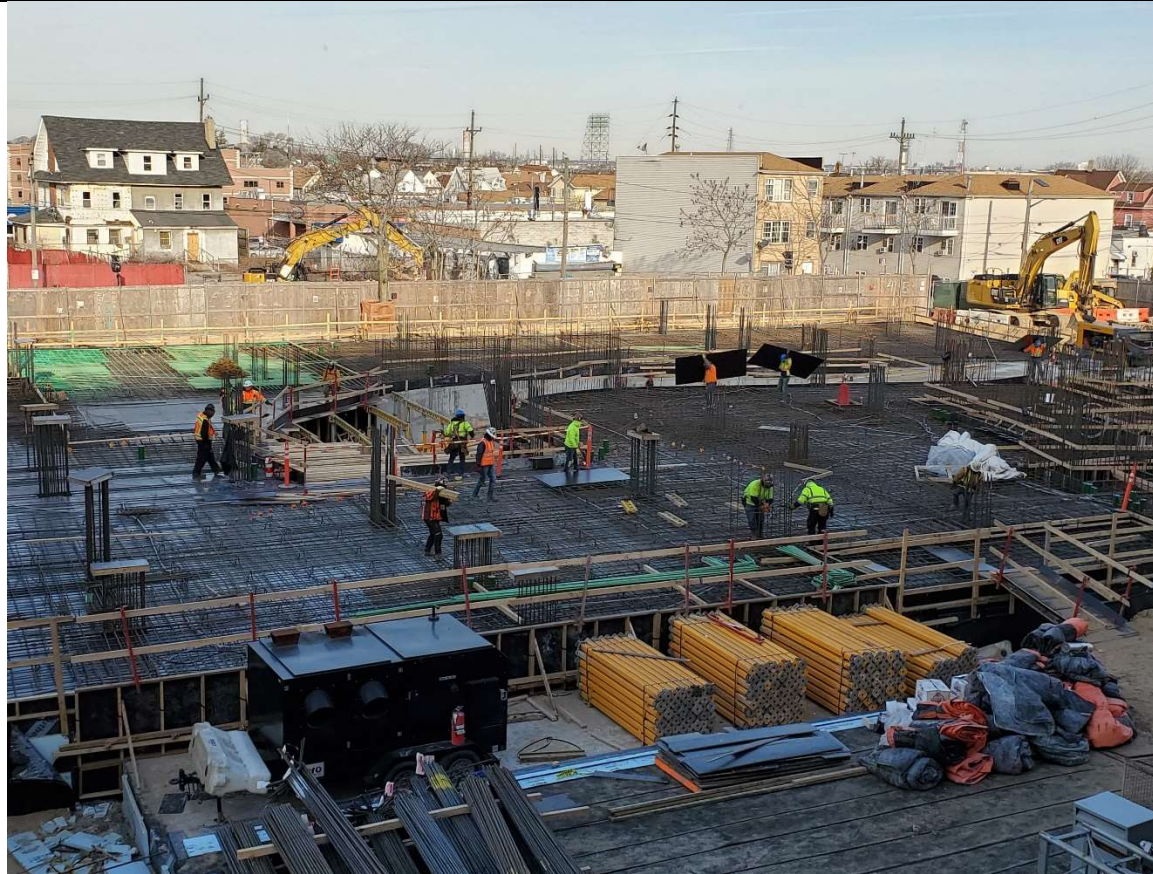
View of soil removal from building H and view of building B grids C4, D4, and E4.
